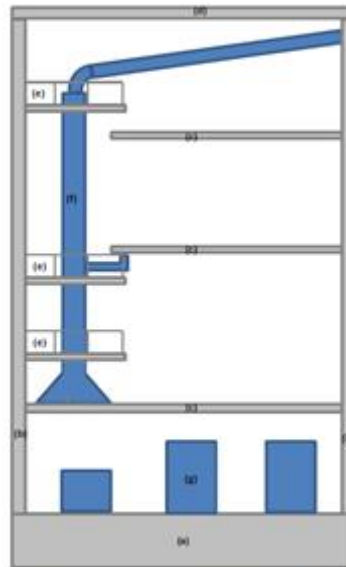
Condenser Facility cross section (looking South, with North external walls removed)
